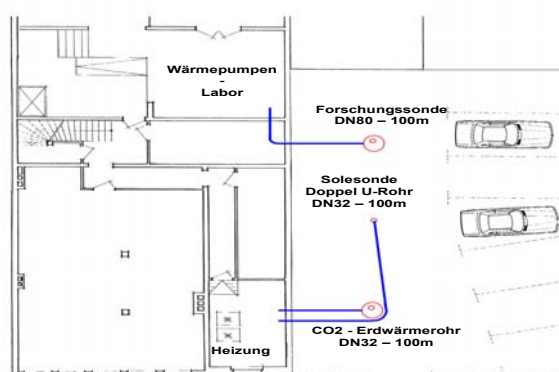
Map of the FKW- underground floor and the parking lot with the three earth probes and connecting pipes to the heating system and the heat pump laboratory
